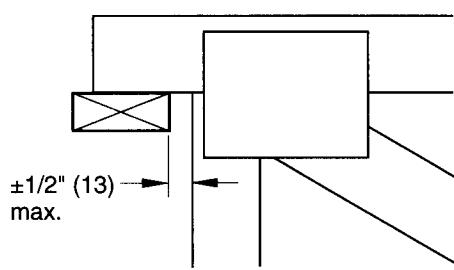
Metal-Plate-Connected Wood Truss Erection
